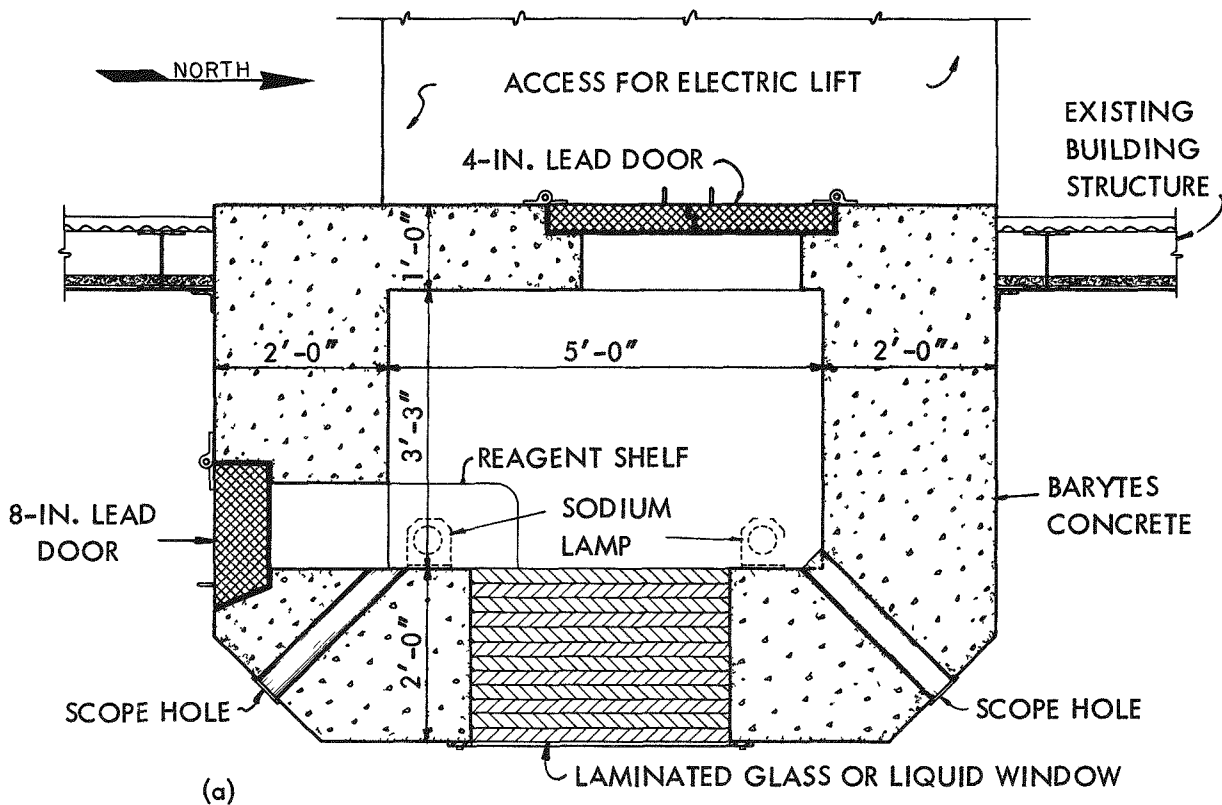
Vertical section of multi-kilocurie loading cell, Remote-control Cell Building, 3029, Oak Ridge.
